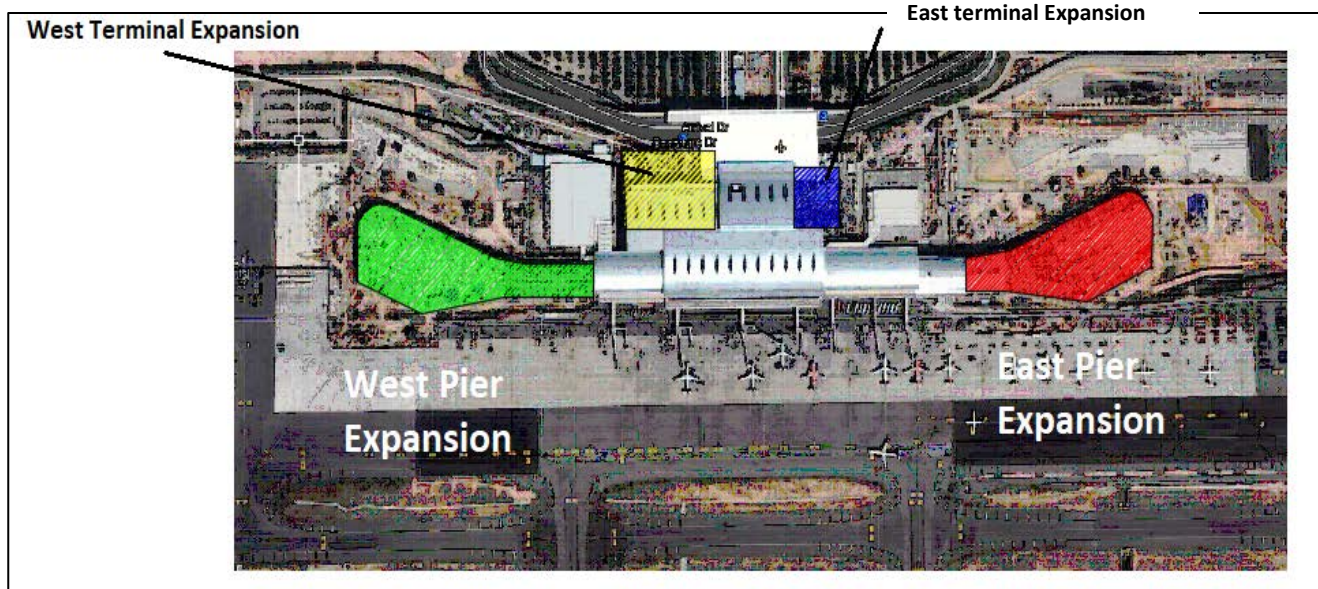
Google image of Proposed Passenger Terminal Building Expansion
